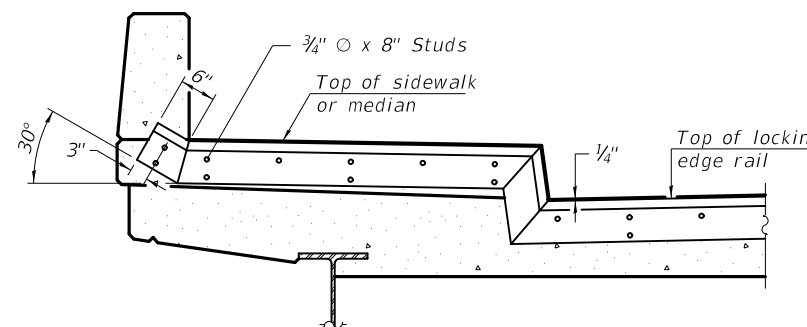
DETAIL-NEW CONCRETE DECK AND WELDED RAIL JOINT
